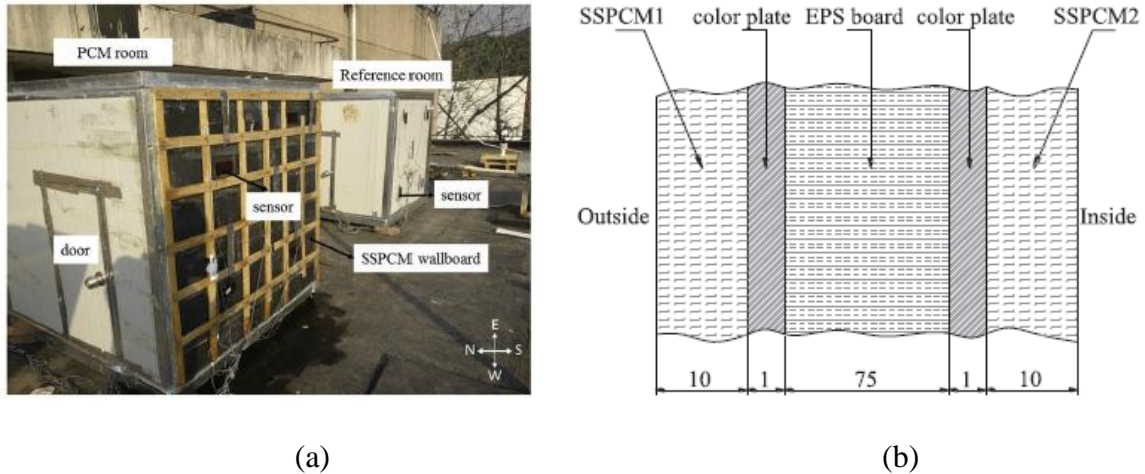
(a) PCM room and Reference room (b) Schematic of the south wall with shape stabilized PCM wallboard (254)
